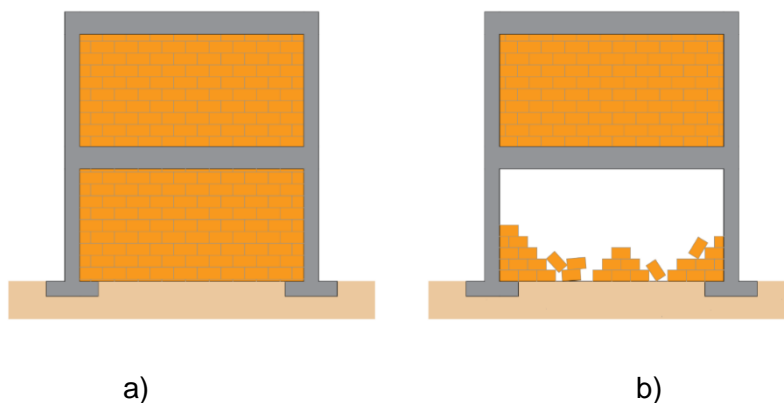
Involuntary creation of a leaked floor. a) Situation at the beginning of the earthquake. b) Situation after the collapse of the masonry walls in the ground floor.
